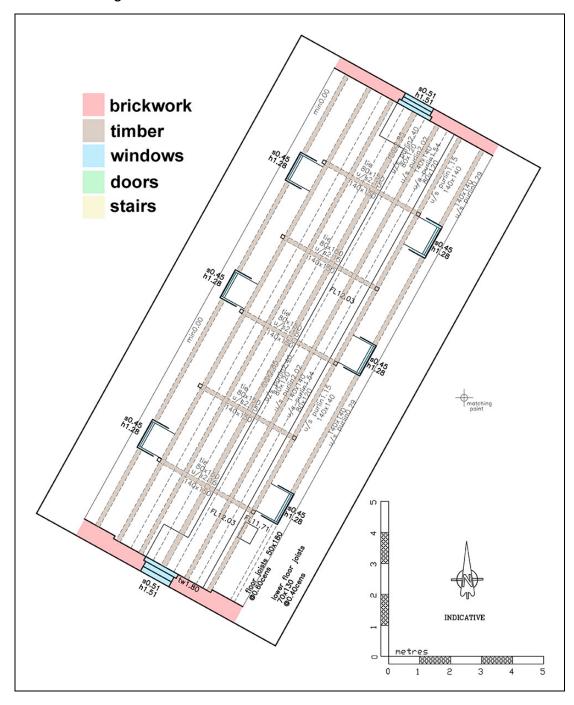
Fourth floor plan of Ashlett Mill showing original features
